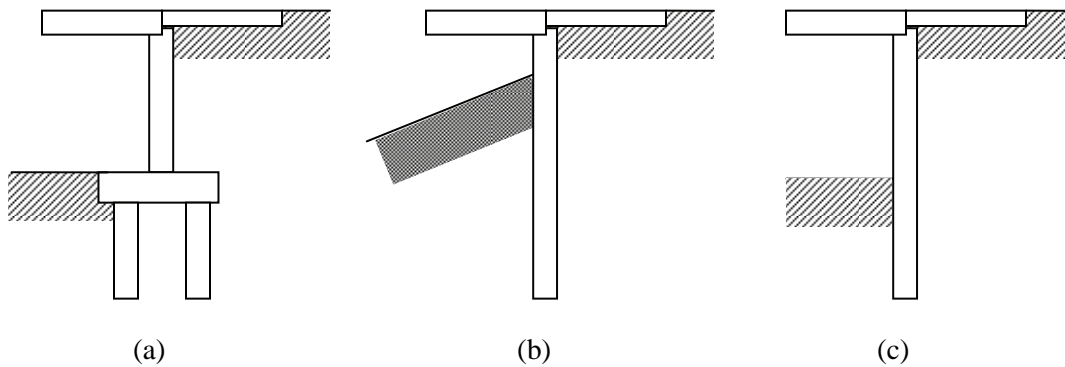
Sketch of Foundation for a Bridge Abutment
